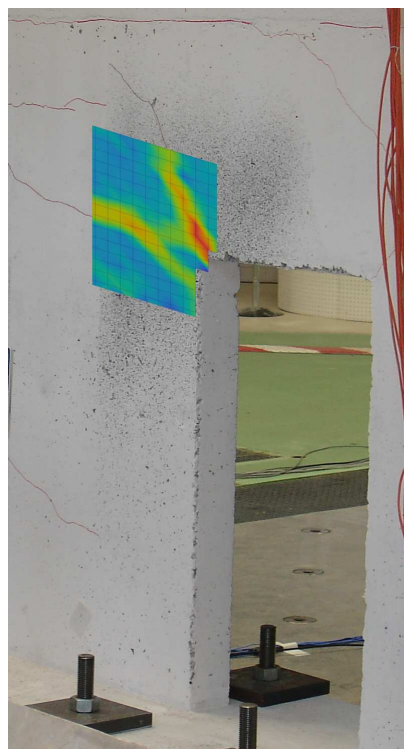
DIC results — input signal with a PGA = 0.2 g — opening at the 1<sup>st</sup> floor — shear wall #3.
